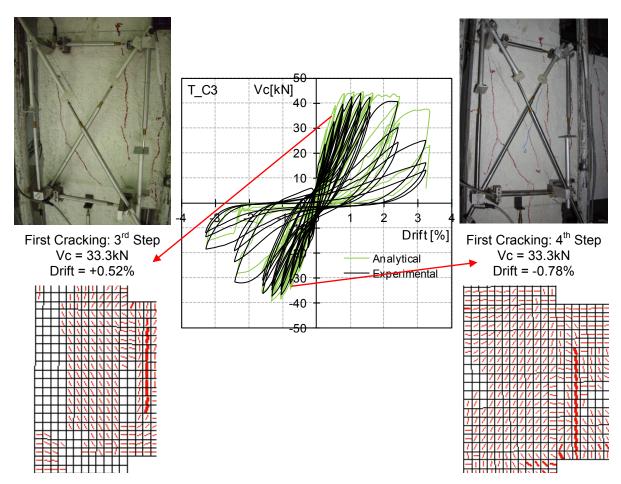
Experimental and analytical crack patterns at the joint panel first cracking (Crack widths: thin<0.5mm; thick>1mm).
